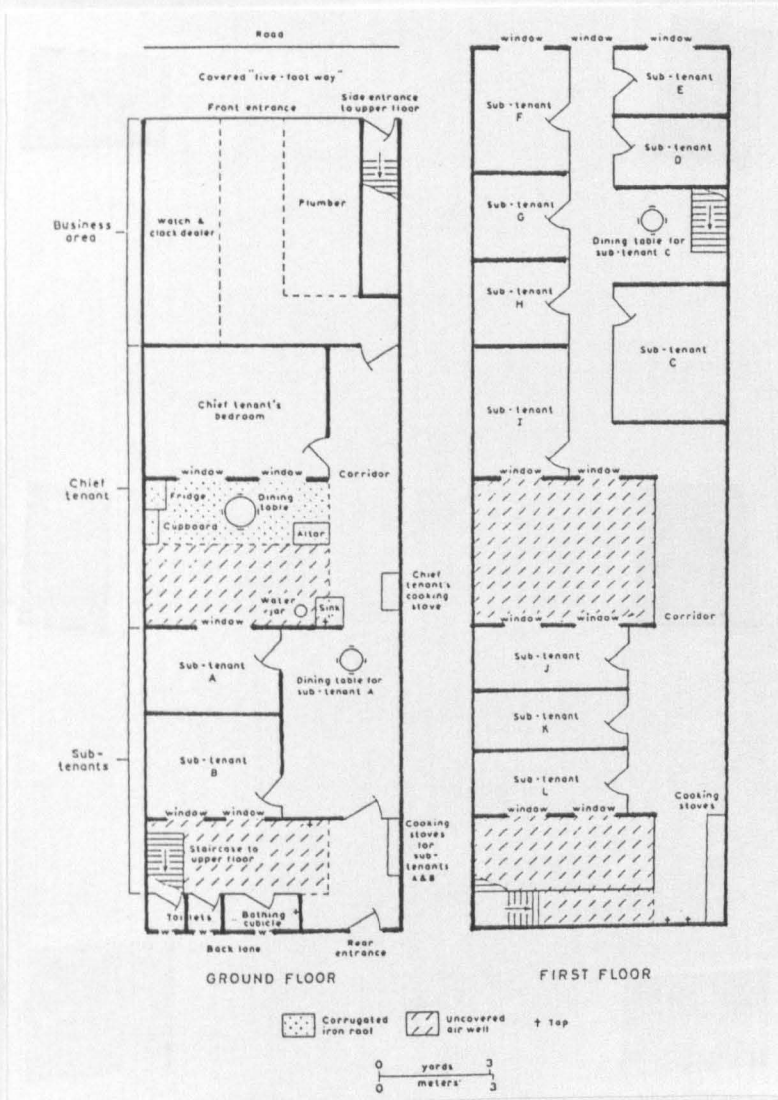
The interior layout of a typical two-storey Chinese shophouse.⁵¹
